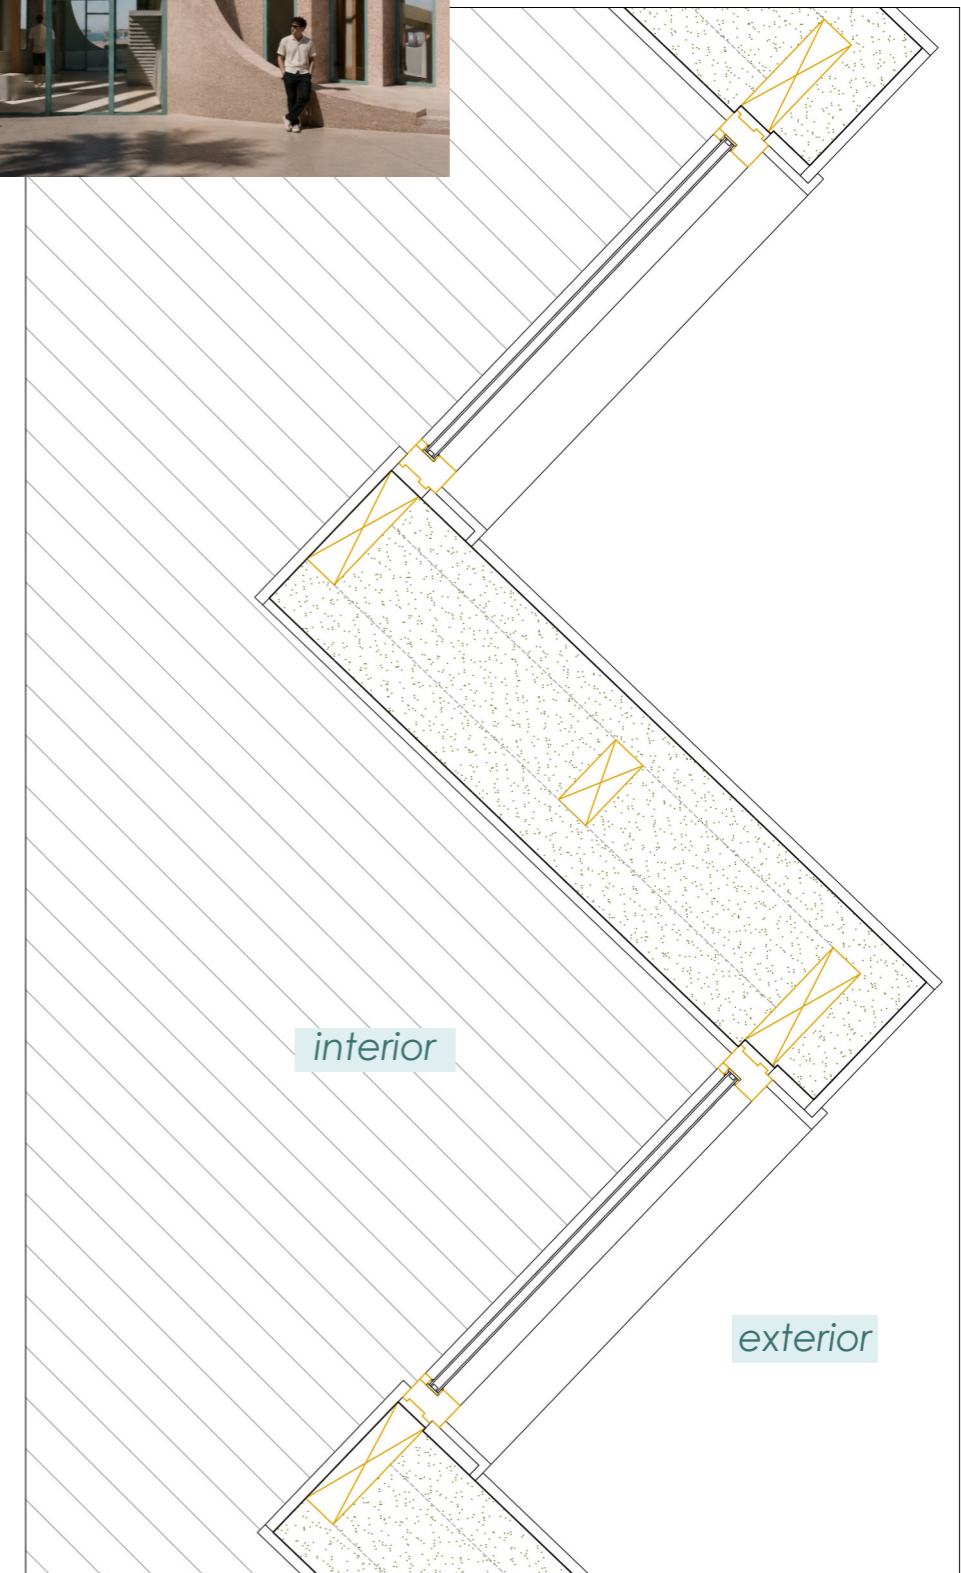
Floor plan detail of projecting window bays, originally designed in 1:10 scale.
